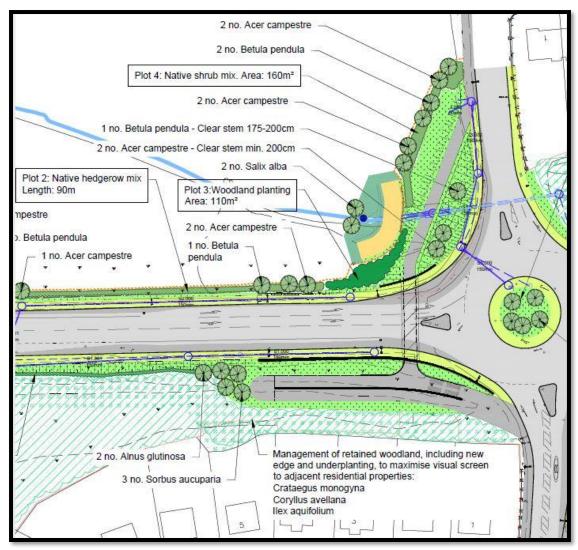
Proposed Planting around underpass (full plan reference: B23006DP/LAND/001 rev1)
